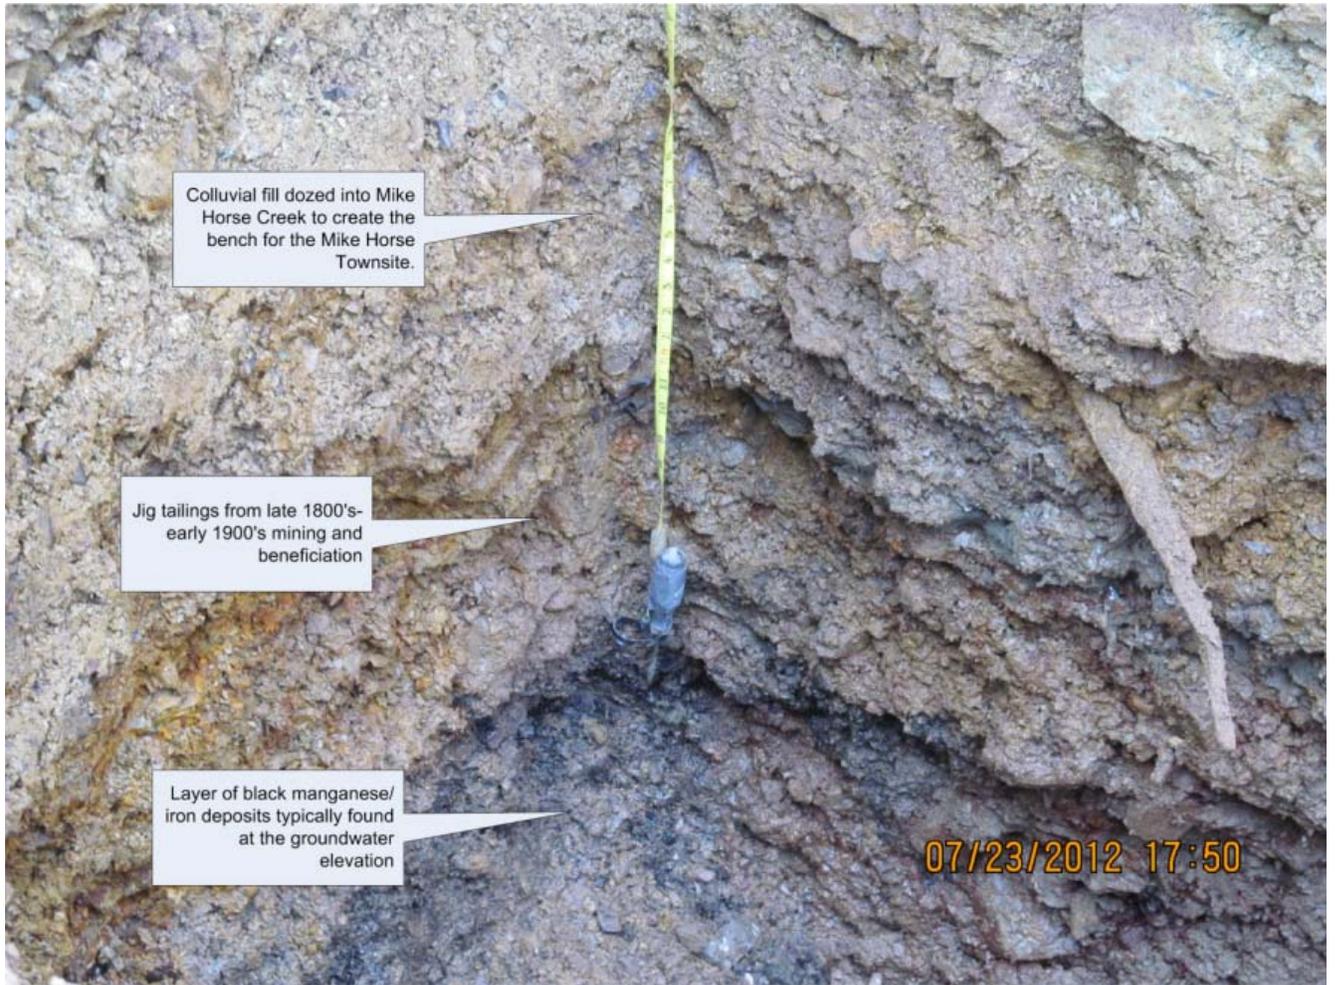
Test Pit showing jig tailings buried under Mike Horse townsite fill
